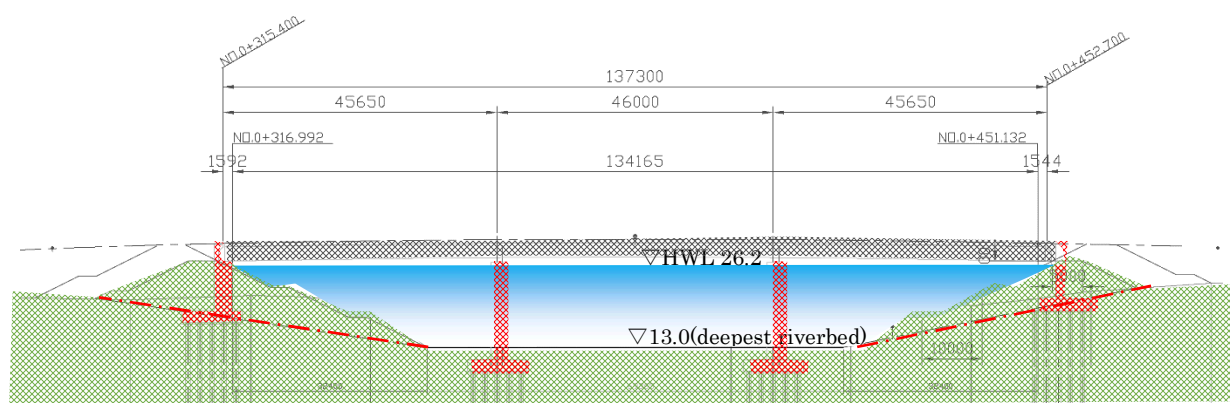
Explanatory Figure of Bridge Length and Span Arrangement for Kapiura Bridge
